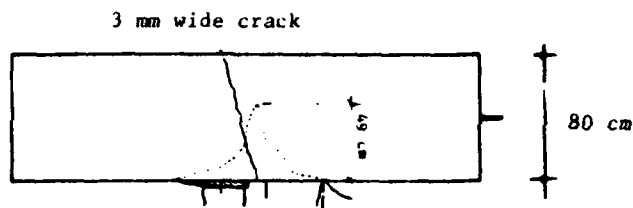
Damage created by a 105 mm artillery shell penetrating a reinforced concrete target
